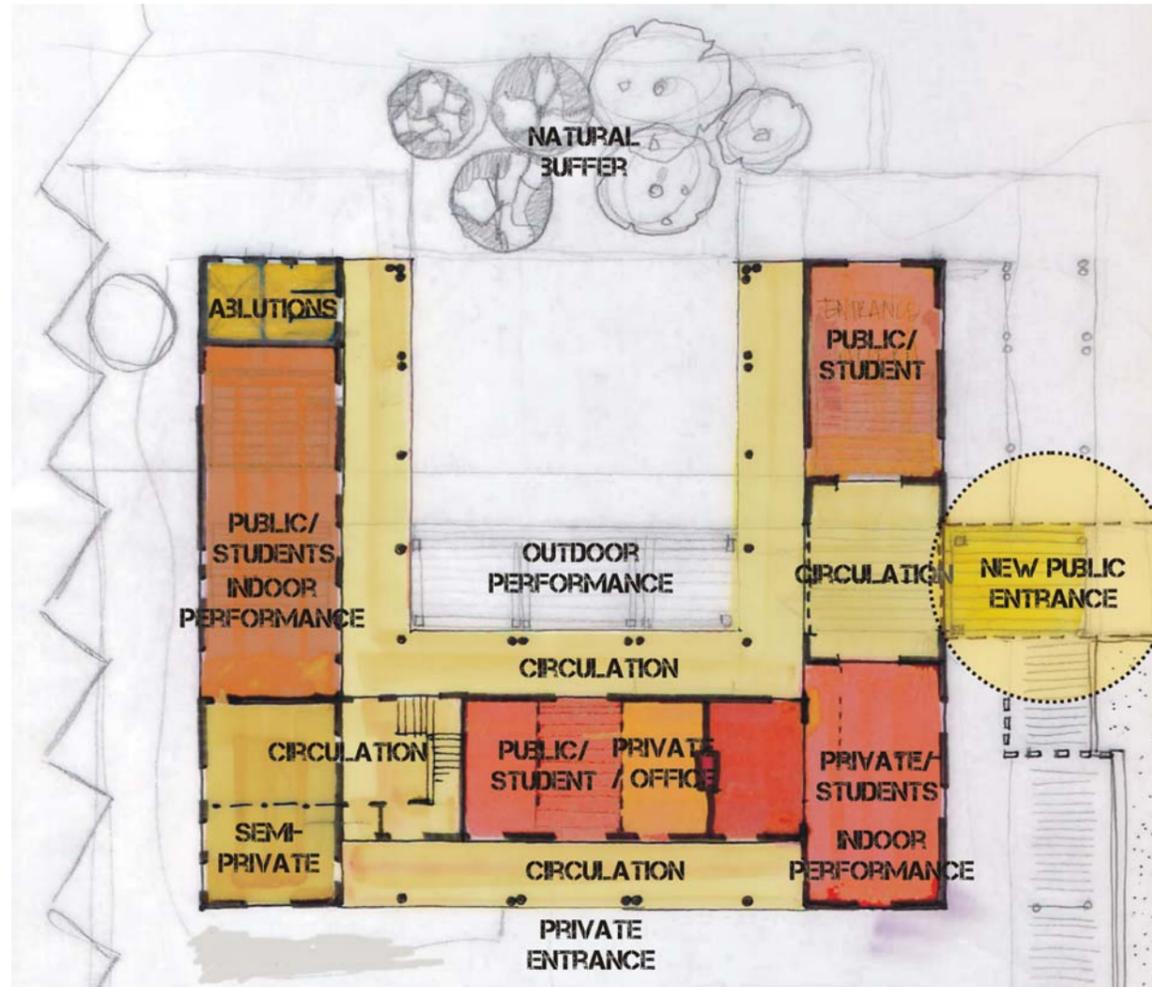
Spatial configuration sketch of the ground floor of the Drama Building.
